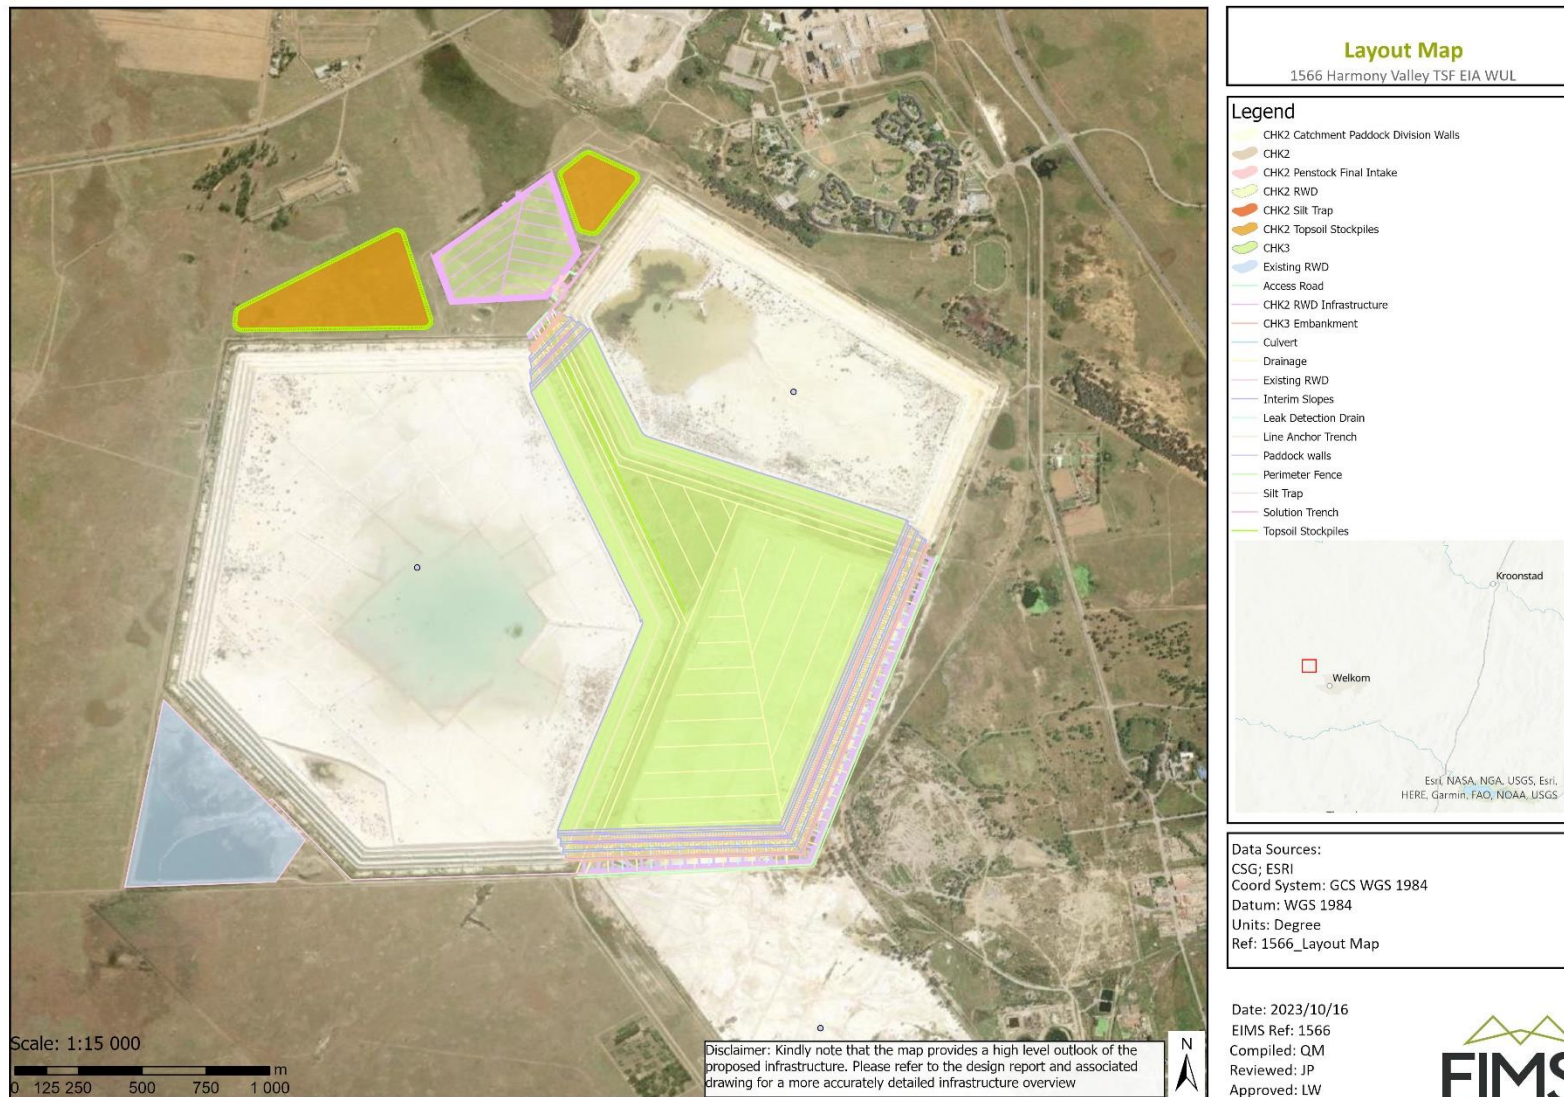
Layout and general arrangement of the proposed Valley TSF (the map also includes the liner alternative as per technology alternative 2)
